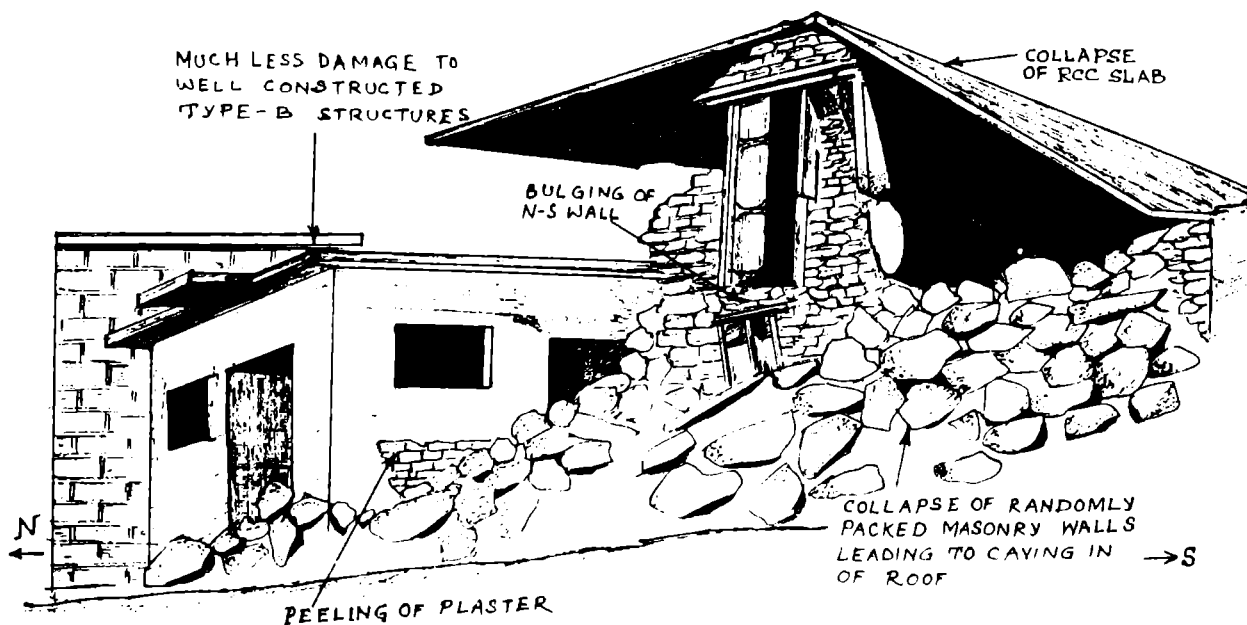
SKETCH SHOWING EXTENT OF DAMAGES TO TYPE 'A' AND TYPE 'B' CONSTRUCTIONS IN SAURA VILLAGE (SKETCH BY P. PANDE)
